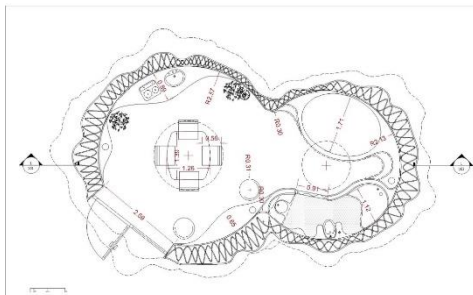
Plan Study of the "Blossom" Chalet, defining double walled building and interior space use (Courtesy of the Author)
